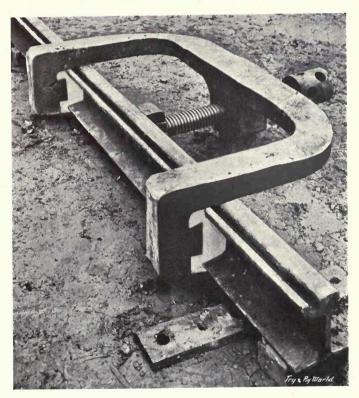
Rail Bender fitted with interchangeable Pallets which engage the entire Rail Section on either Side.
